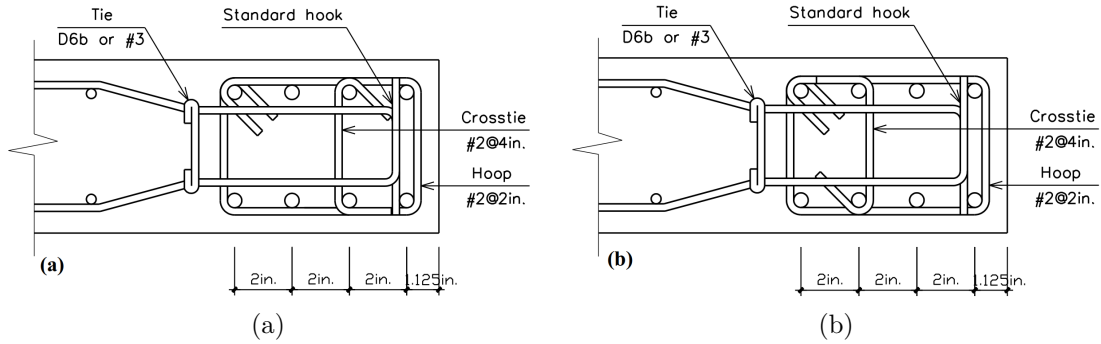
Typical wall boundary detailing, Detail A (Tran, 2012).
